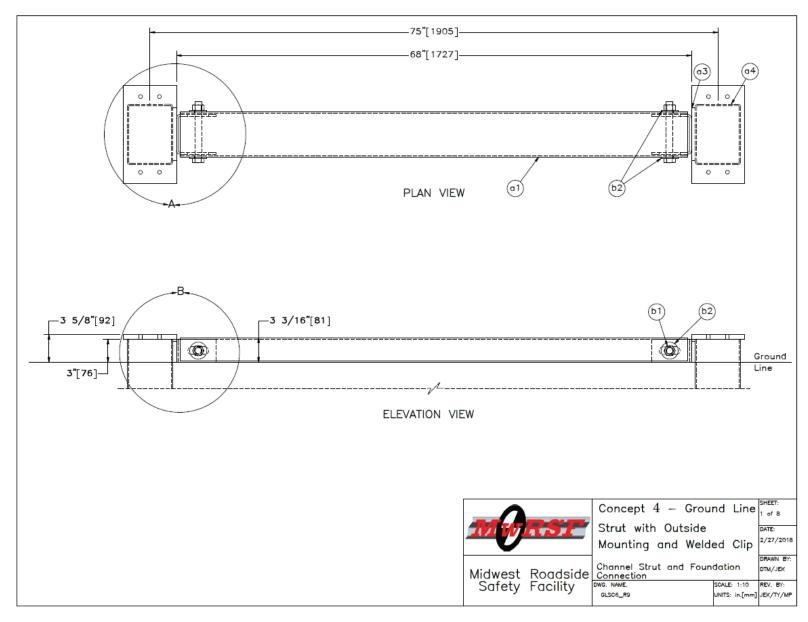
Ground Line Strut Concept No. 4 – Channel Strut and Foundation Connection
